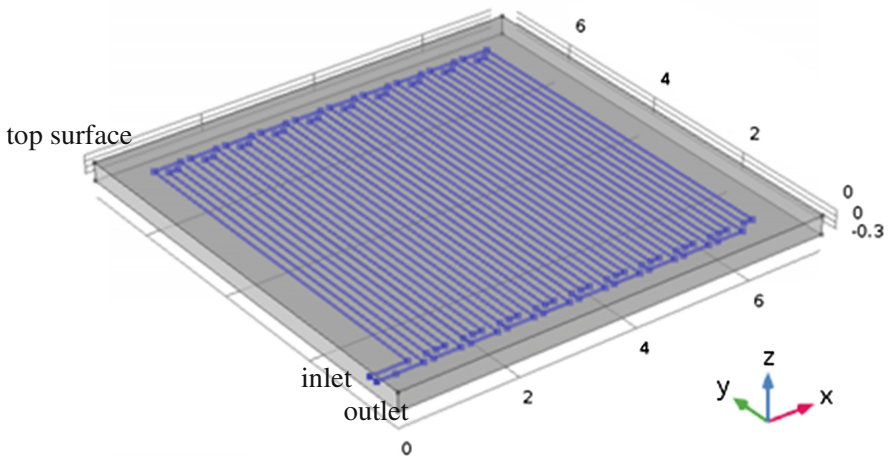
Three-dimensional view of a snow-melting concrete pavement panel with embedded pipes in the finite element model
